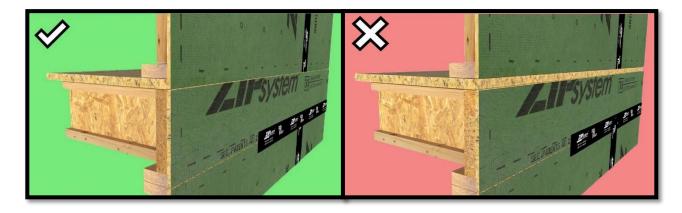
Plan ahead to ensure the ZIP System sheathing seam above the rim joist will take into account the thickness of the subfloor.
